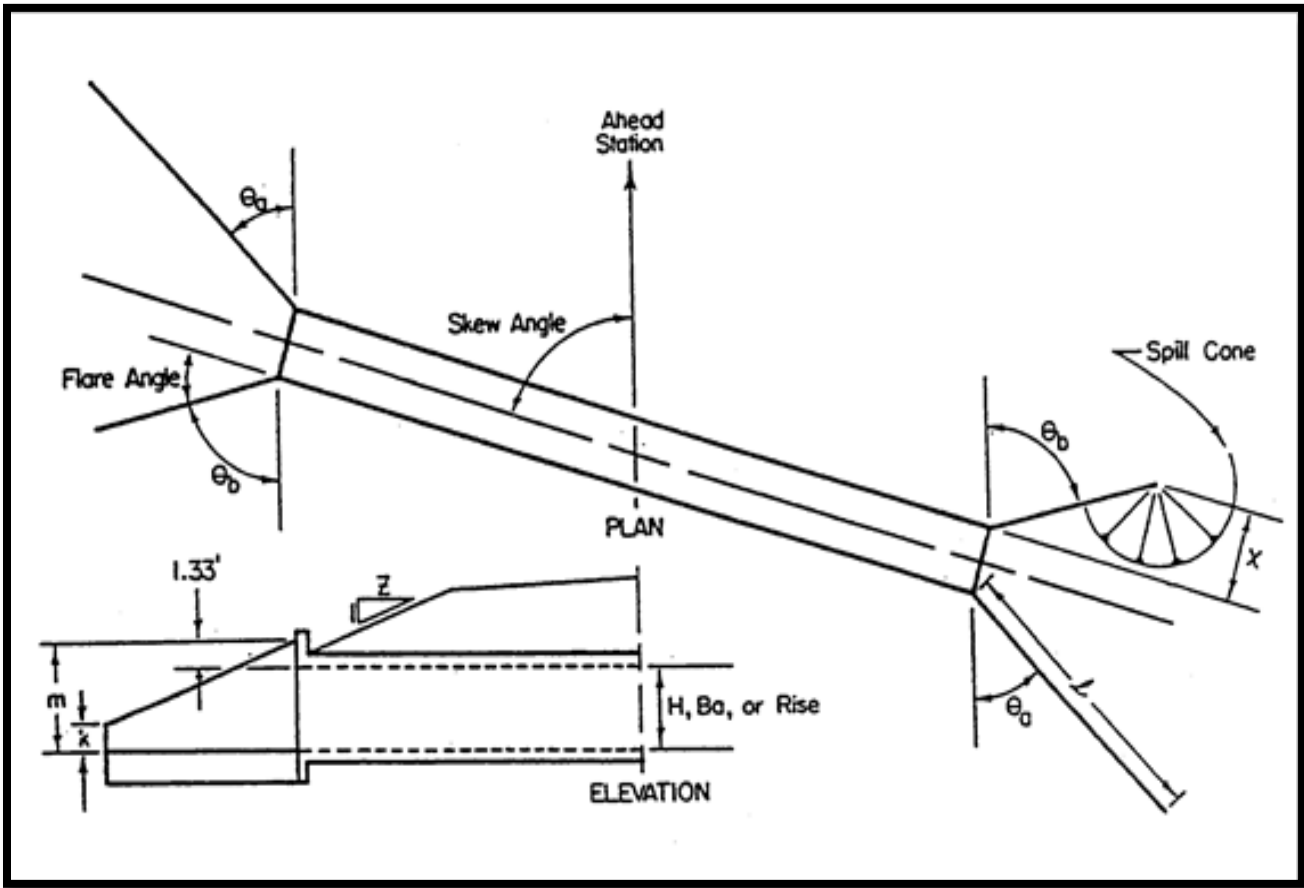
Schematic drawing of a skewed culvert layout from (Figure 9.9 in the CDOT DDM).
